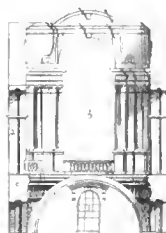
Elevation drawn from Pozzo's Preliminary Drawing. (Author).
